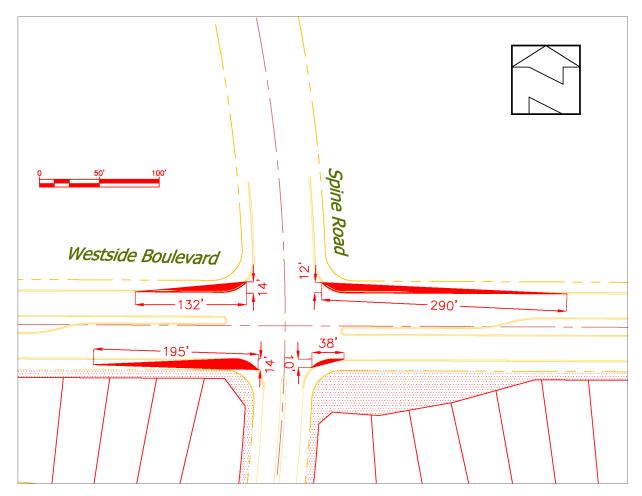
Sight Distance Layout for Westside Blvd and Spine Road
